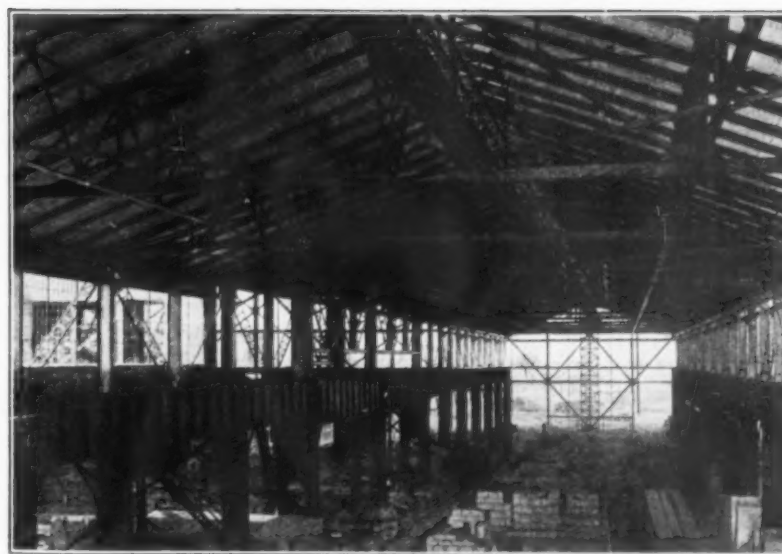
FORGE AND FURNACE BUILDING, SOUTH AISLE, LOOKING NORTH-EAST FROM CRANE GIRDER, JULY 12, 1920
